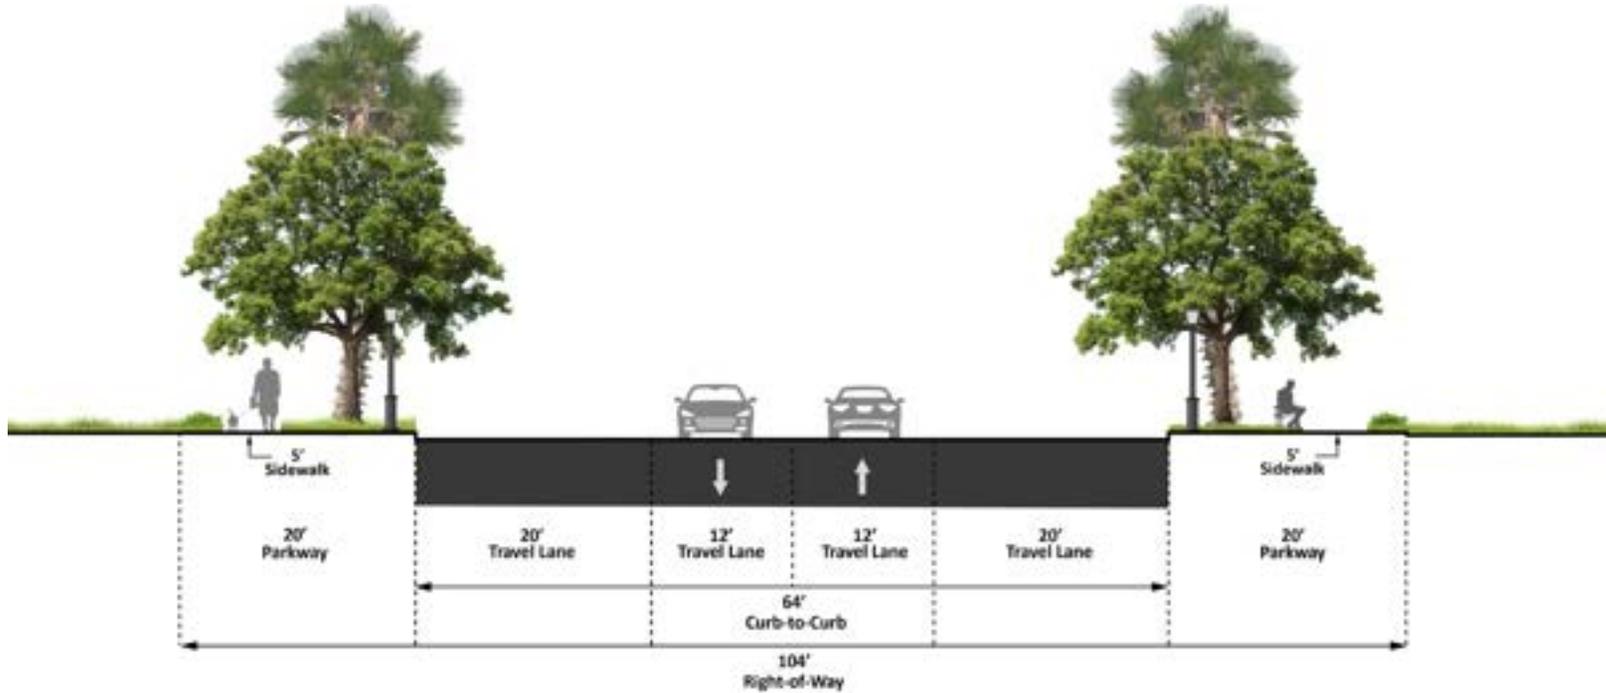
Sixth Street Typical Cross Section (West of Main St)
